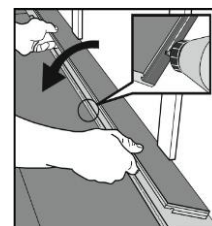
Last row (and perhaps also first row). The minimum width of the last plank should be NOT LESS than 50 mm. Remember distance to wall is 12-15 mm. Tip! Put a spacer before measuring. Cut the planks lengthwise and glue the short ends. See instructions below.
